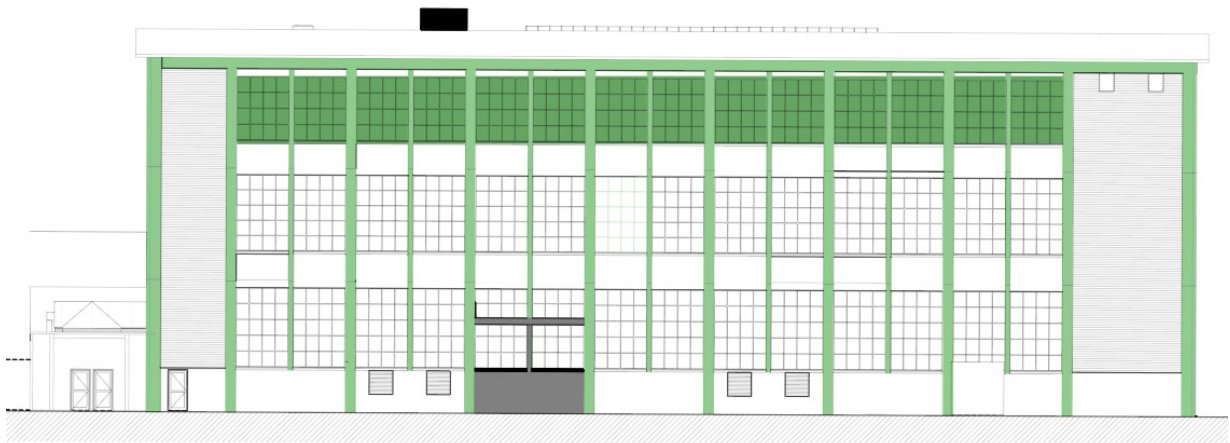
Side Facade Gusto MSC. Column structure and new windows highlighted in green
